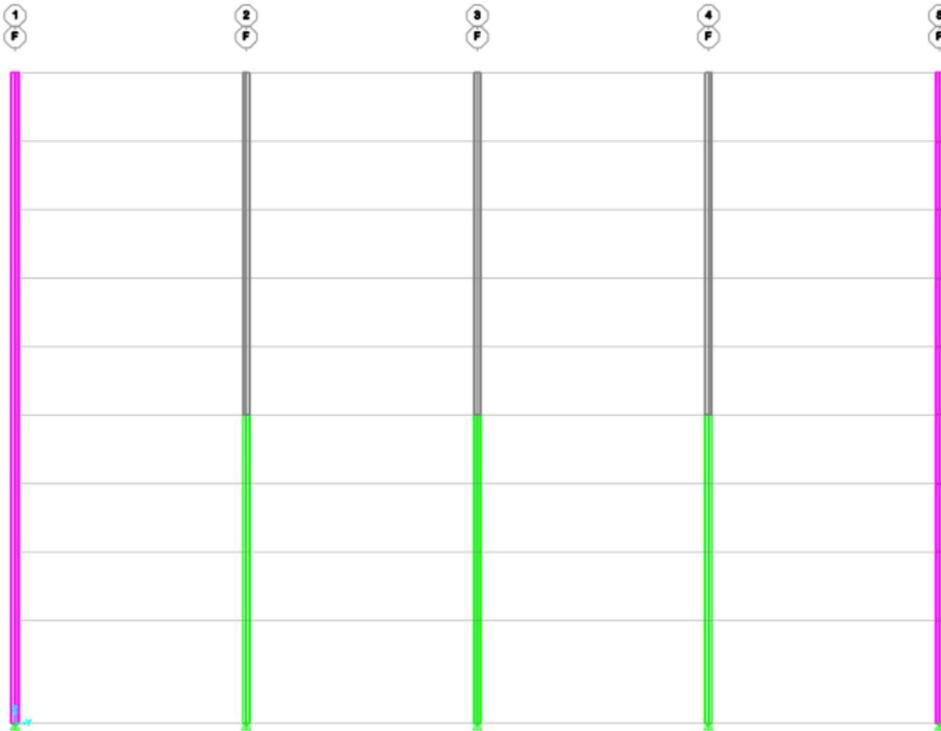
Column cross-section layout in the face F (SAP2000)
